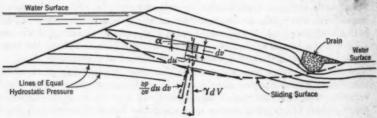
SEEPAGE FORCES IN AN EARTH DAM
